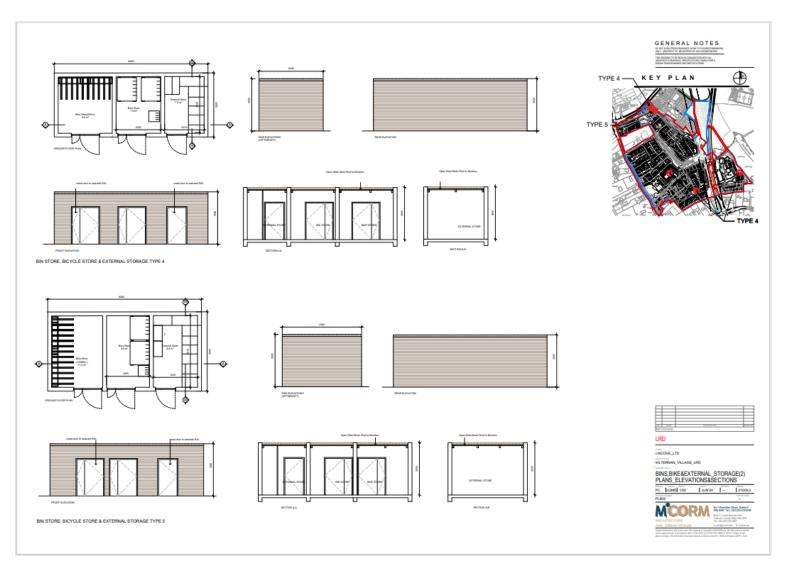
Internal Layout of Waste Storage Area Types 4 and 5
